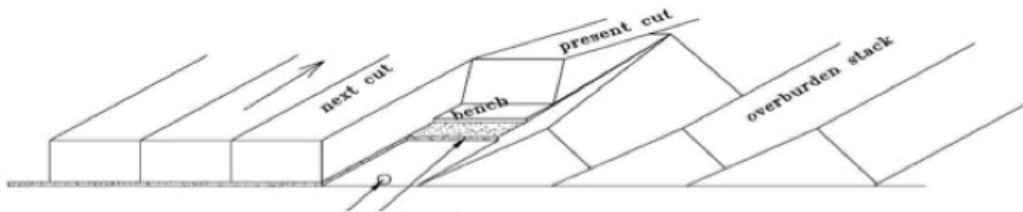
Reclaim the mined out area with overburden from the first trench
